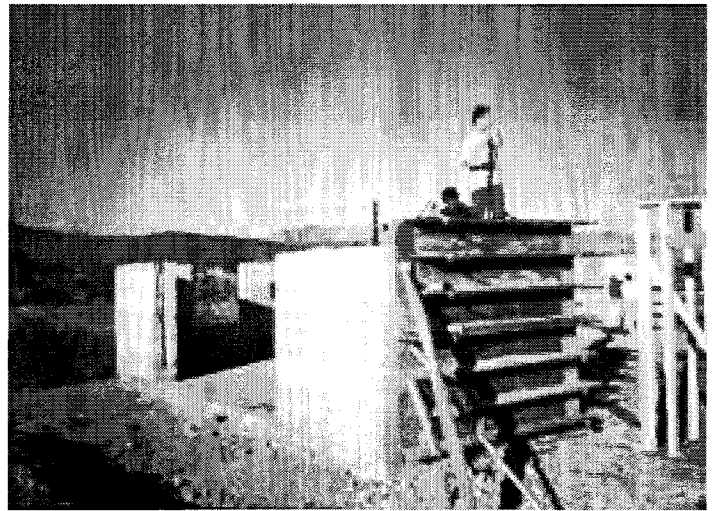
Stage of Design/Build Studio project: construction of a rammed earth residence. Finished rammed earth wall and formwork.
